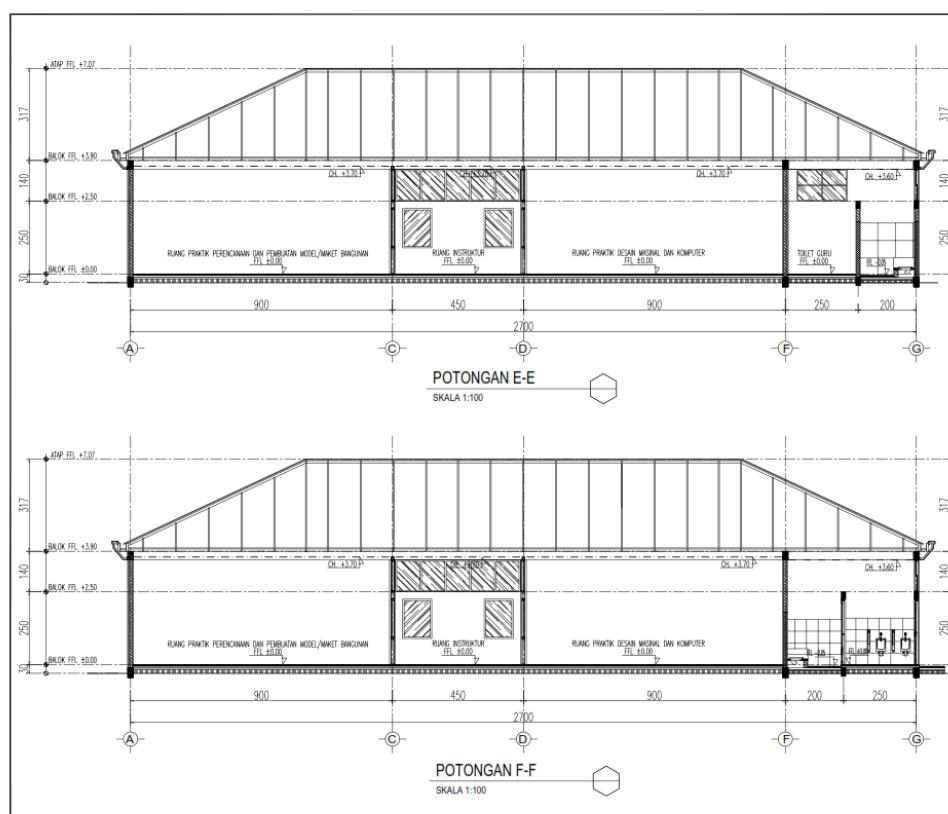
Elevations and Sections of the DPIB Laboratory Design
